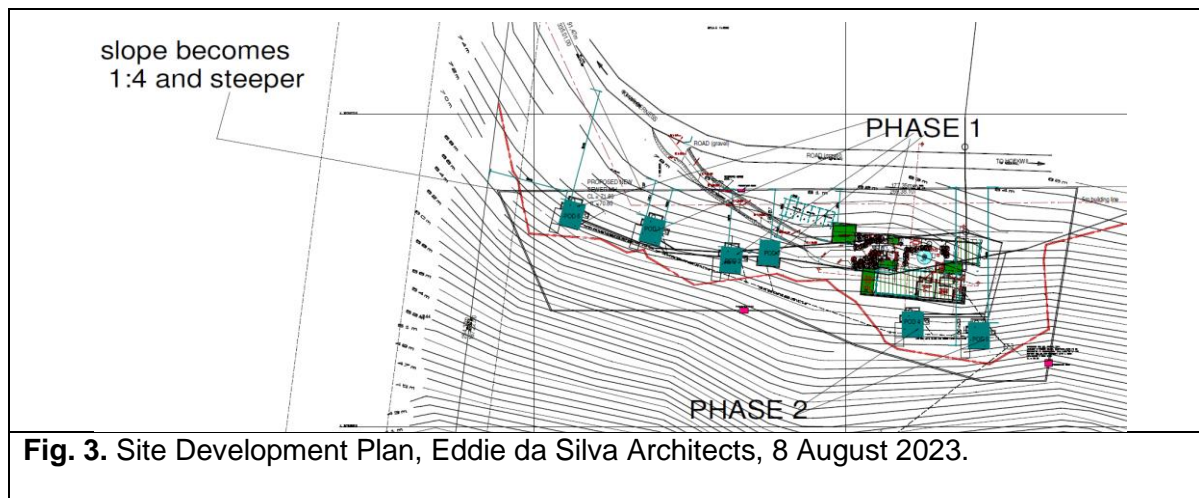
Site Development Plan, Eddie da Silva Architects, 8 August 2023.
